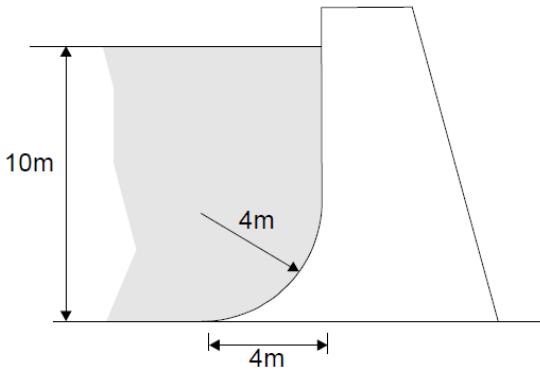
Concrete dam / Rajah 8: Empangan konkrit
